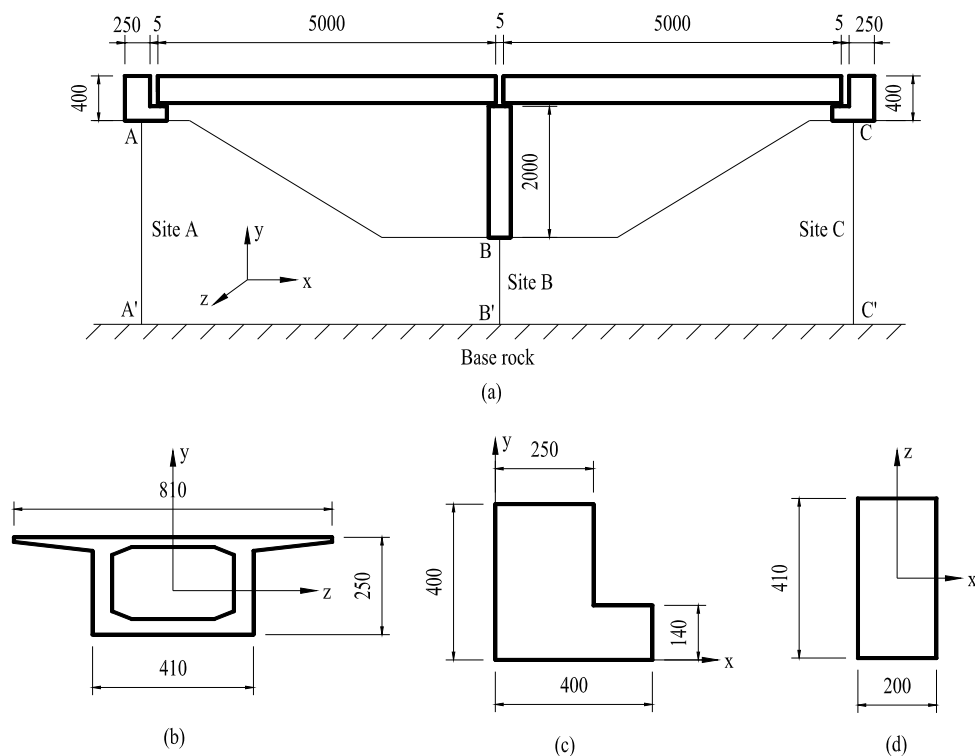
(a) Elevation view of the bridge, (b) Cross-section of the bridge girder, (c) Cross-section of the abutment and (d) Cross-section of the pier (unit: cm).
